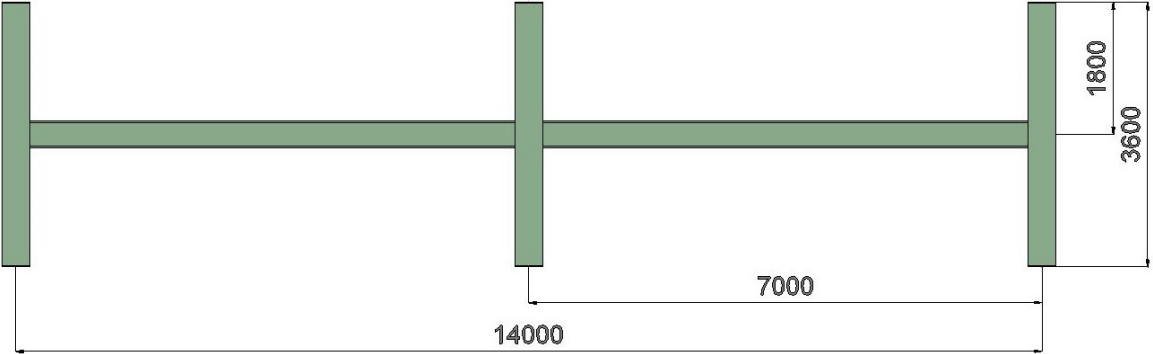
Elevation view of gravity module (dimensions in mm)
